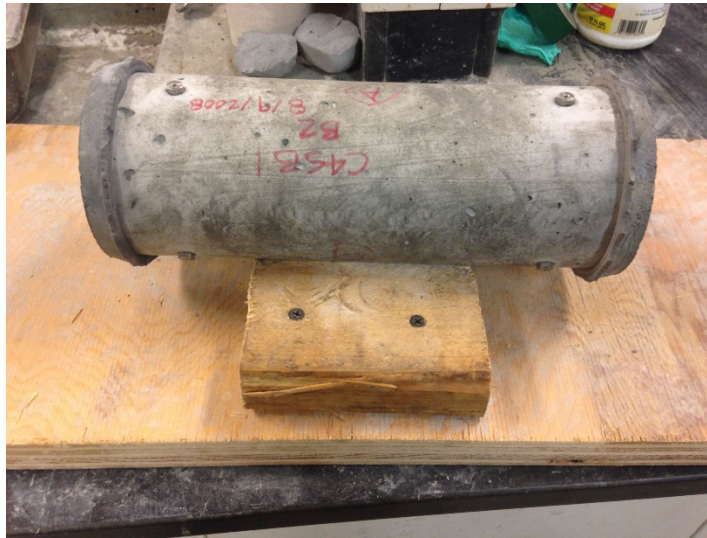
Demonstration of the stand built for stabilizing the cylinder, with a concrete cylinder installed
